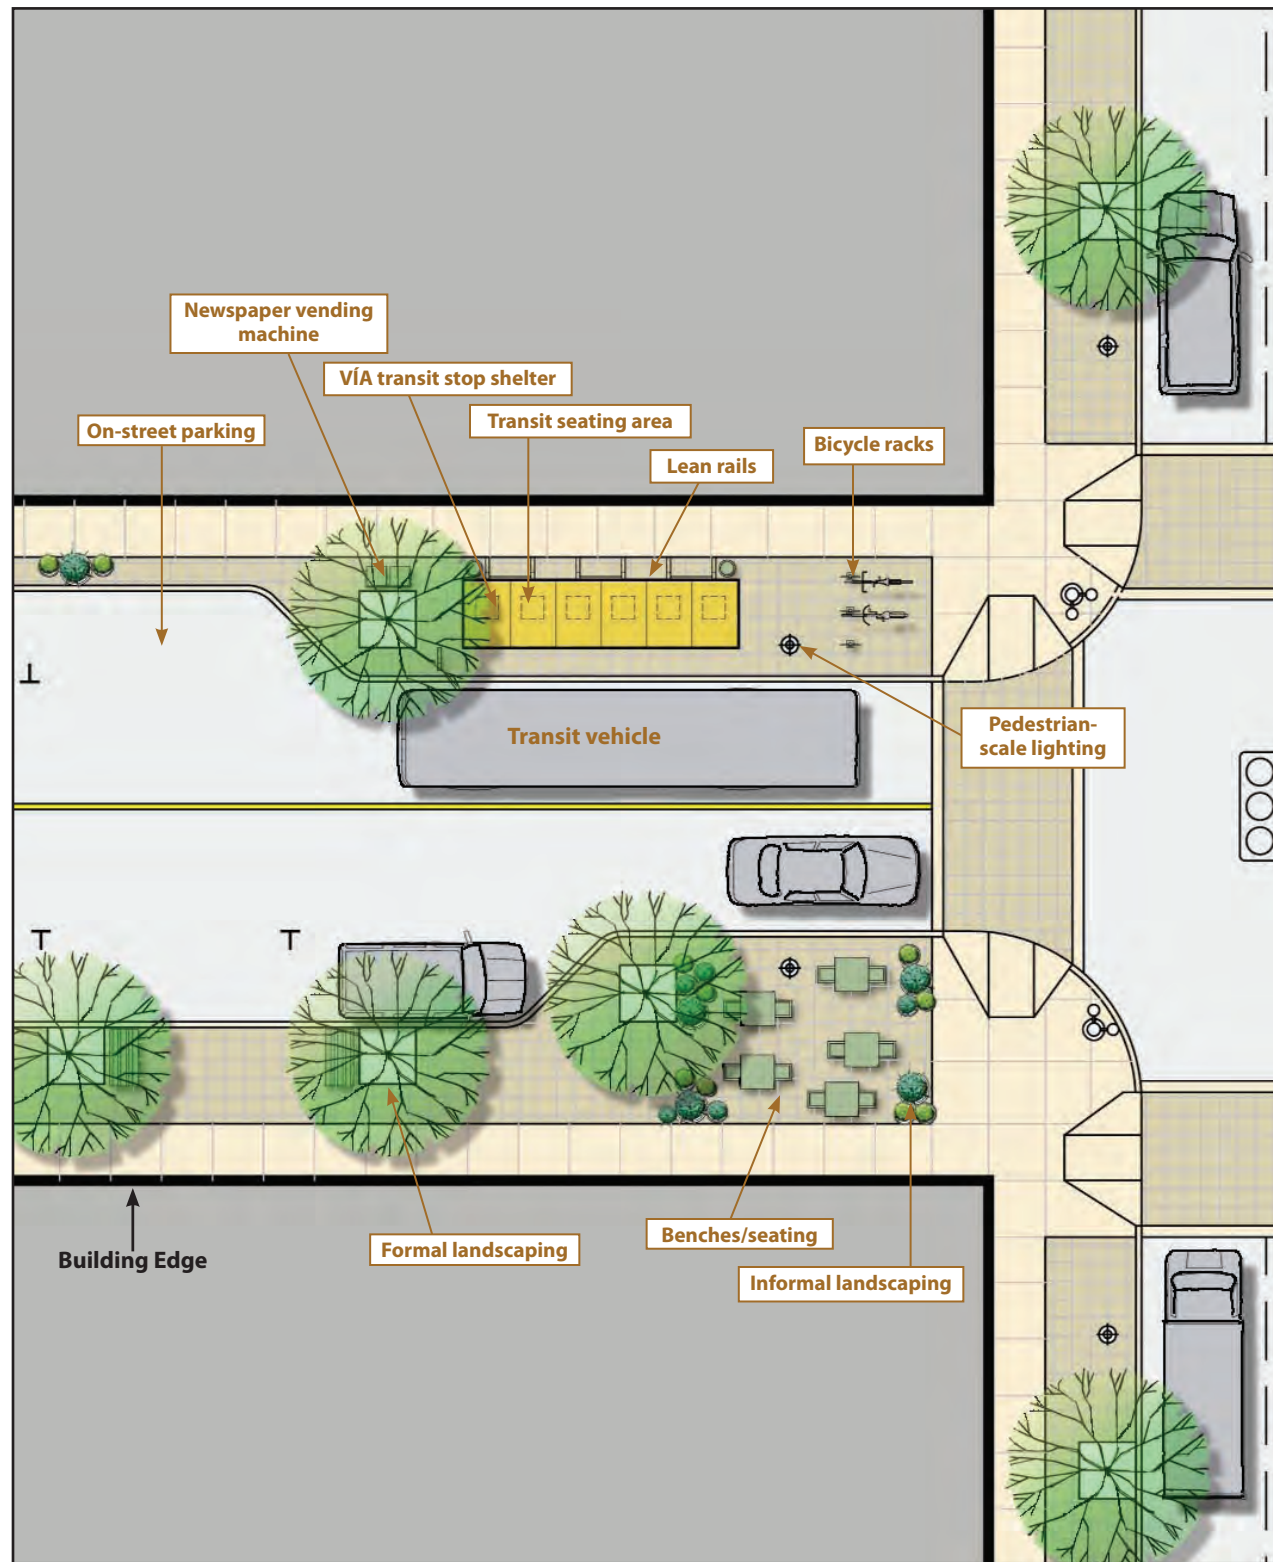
Transit Street Overlay on Downtown Activity Streets
